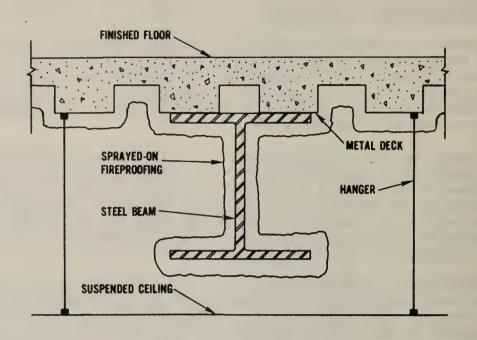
Sketch of typical return air plenum configuration with exposed fireproofing on structural steel and deck
